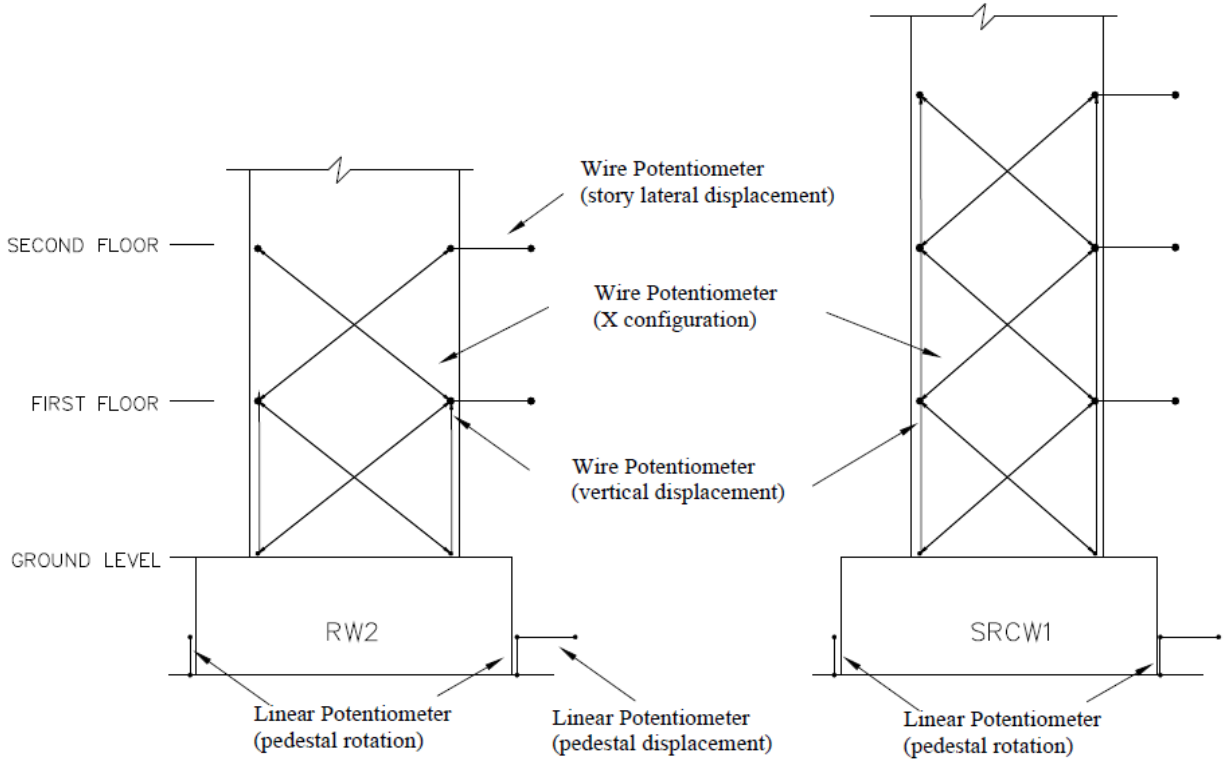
Instrumentation Provided (Massone and Wallace, 2004)
